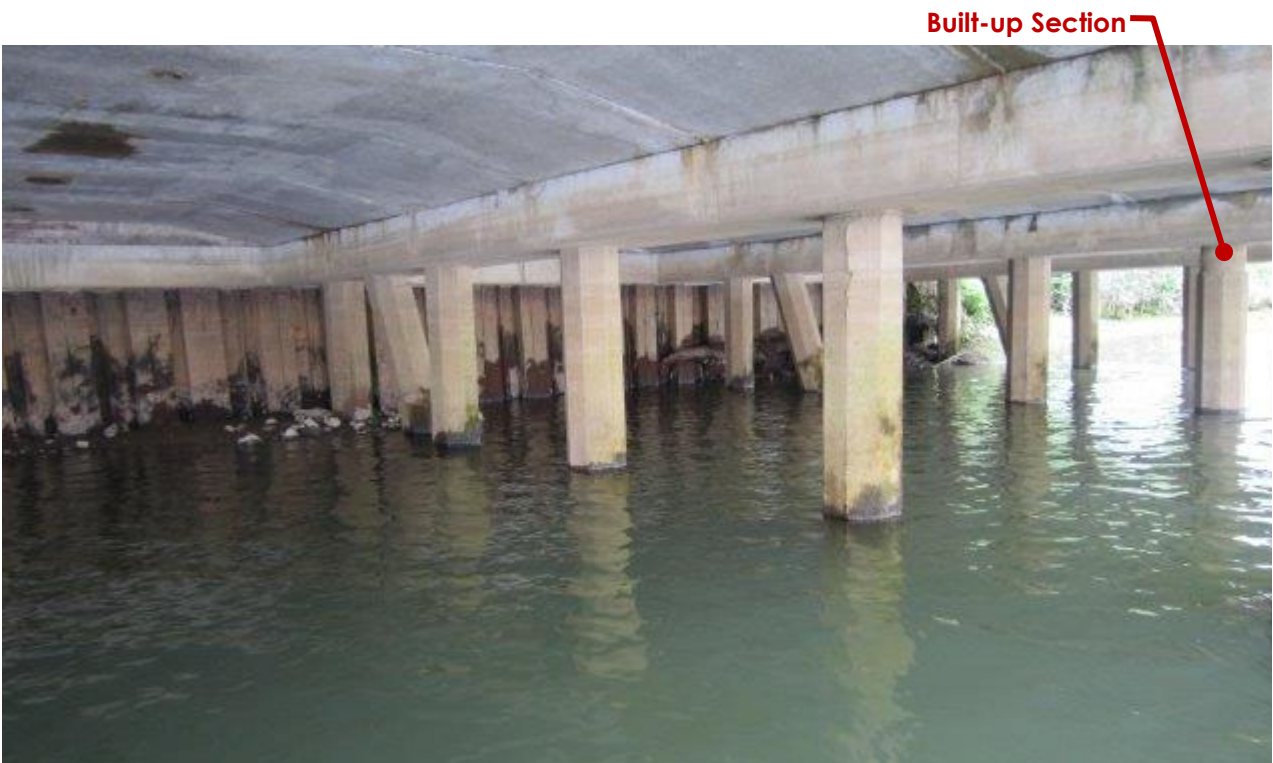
Piles and Pile Caps (Looking Northwest)
